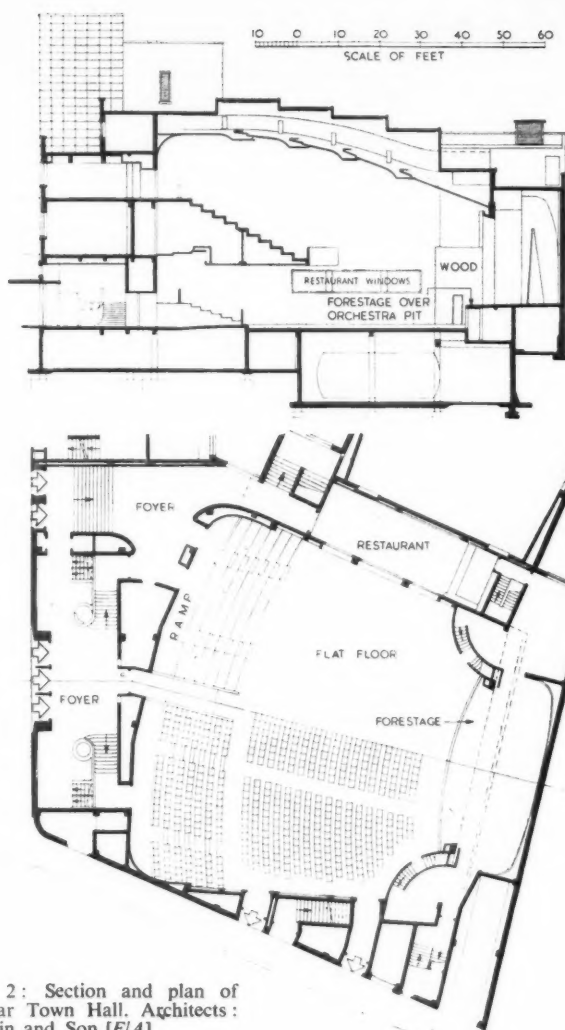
Section and plan of Poplar Town Hall. Architects: Culpin and Son [F/A]
